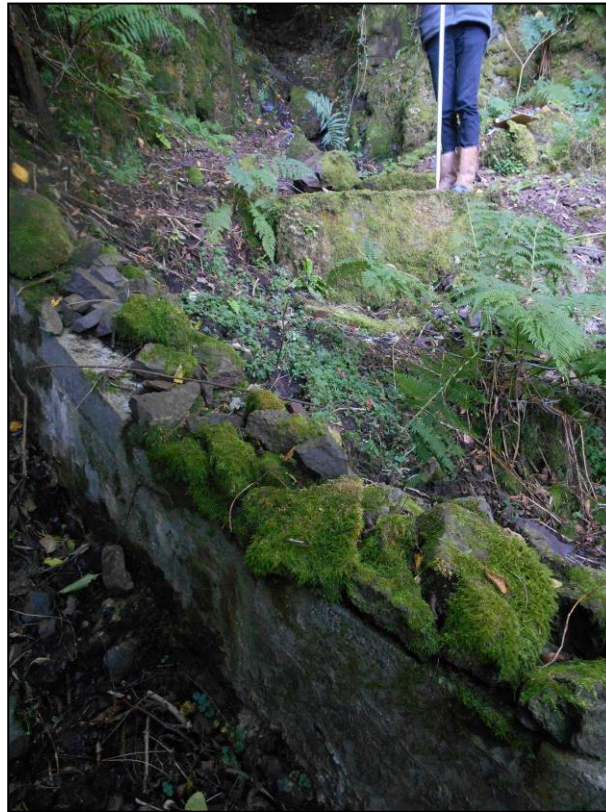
Concrete wall constructed to rear of Marypark House to deflect water flow in case of blockage.
